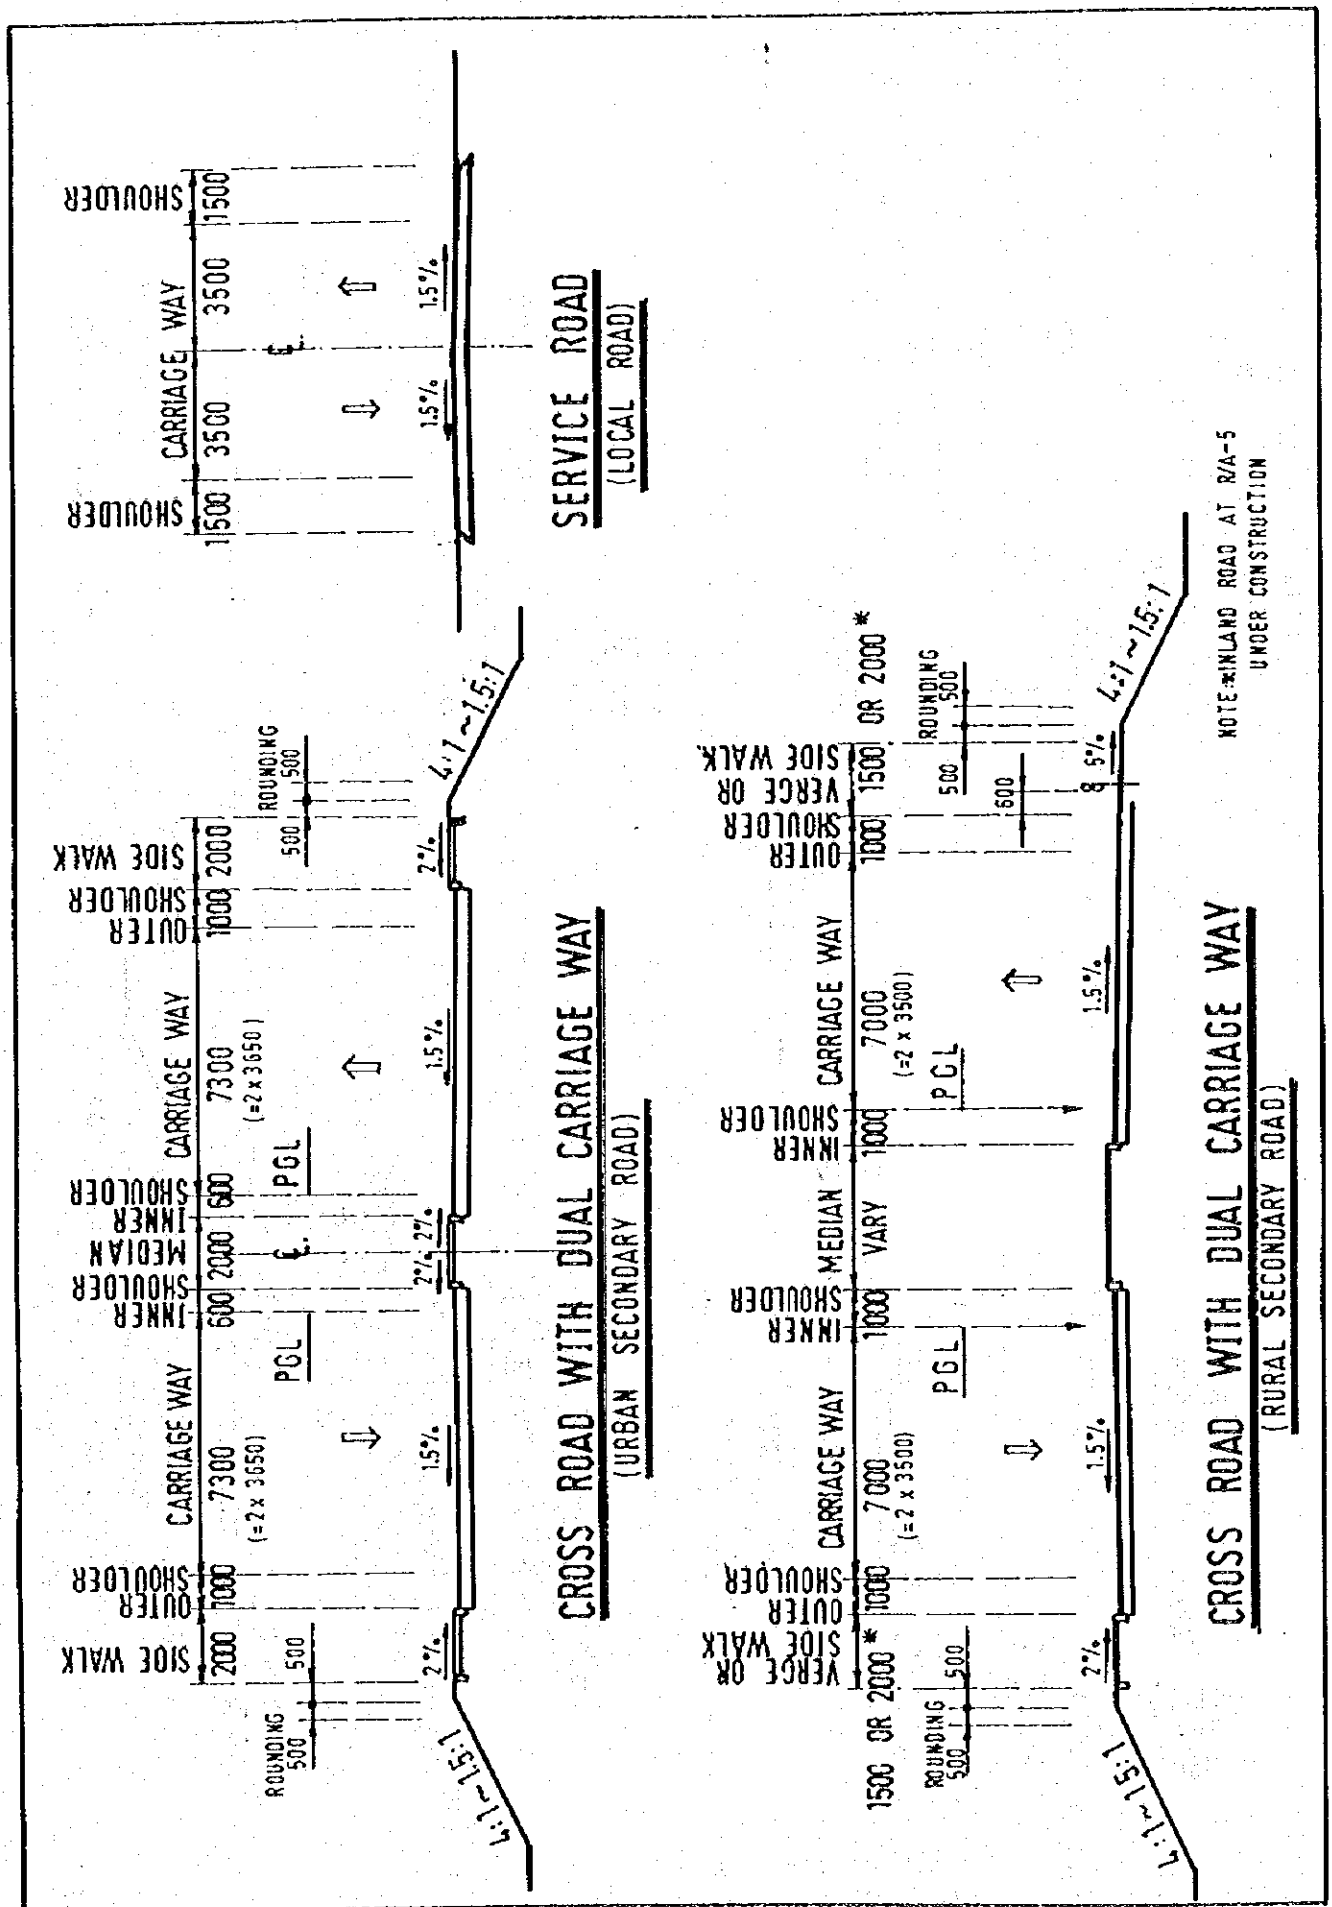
Typical Cross-Sectional Details of Proposed Dual Carriageway Cross-Road
